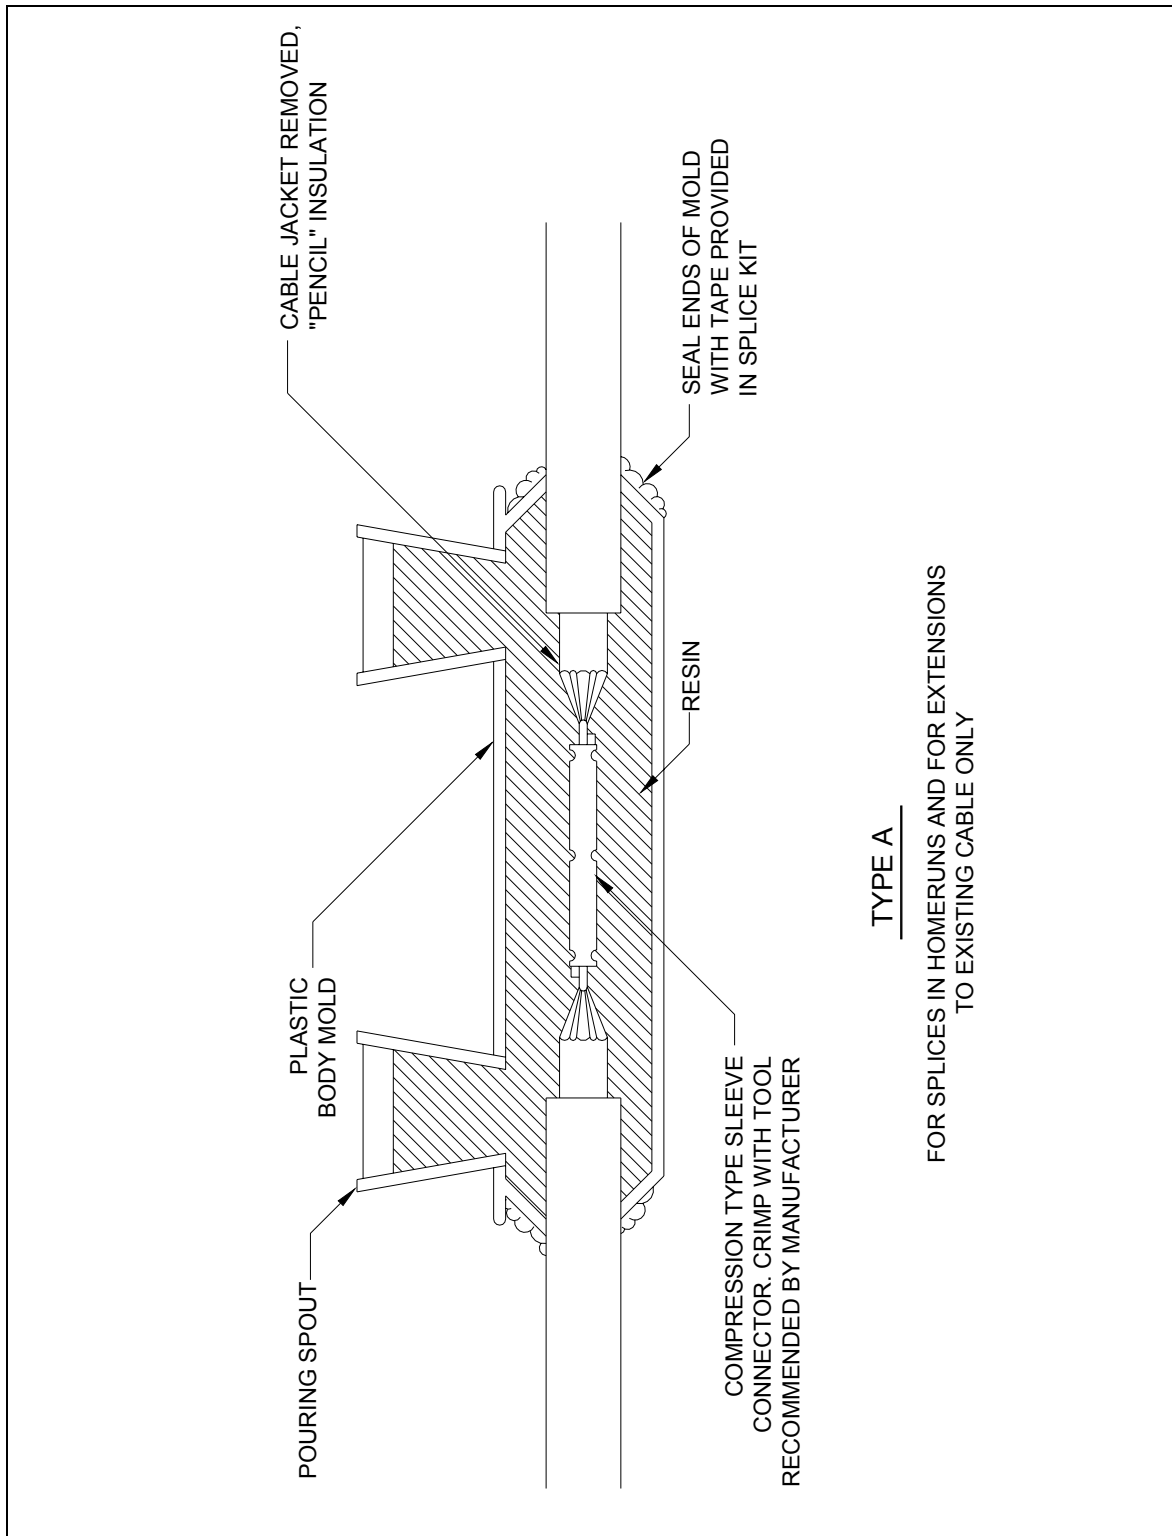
Standard Details for Underground Cable Installation – GL-600 Sheet 2D – Type A
